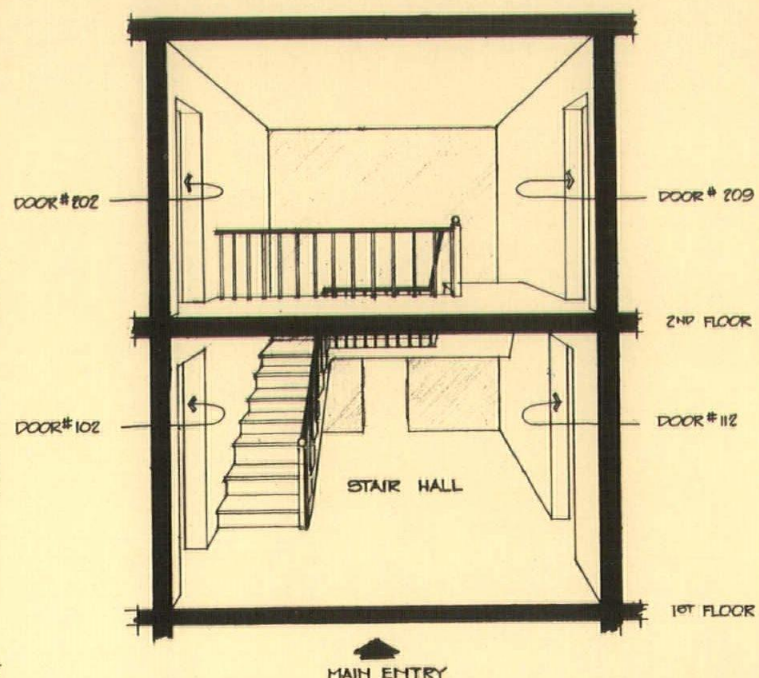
ENTRANCE HALL, WORNALL HOUSE
